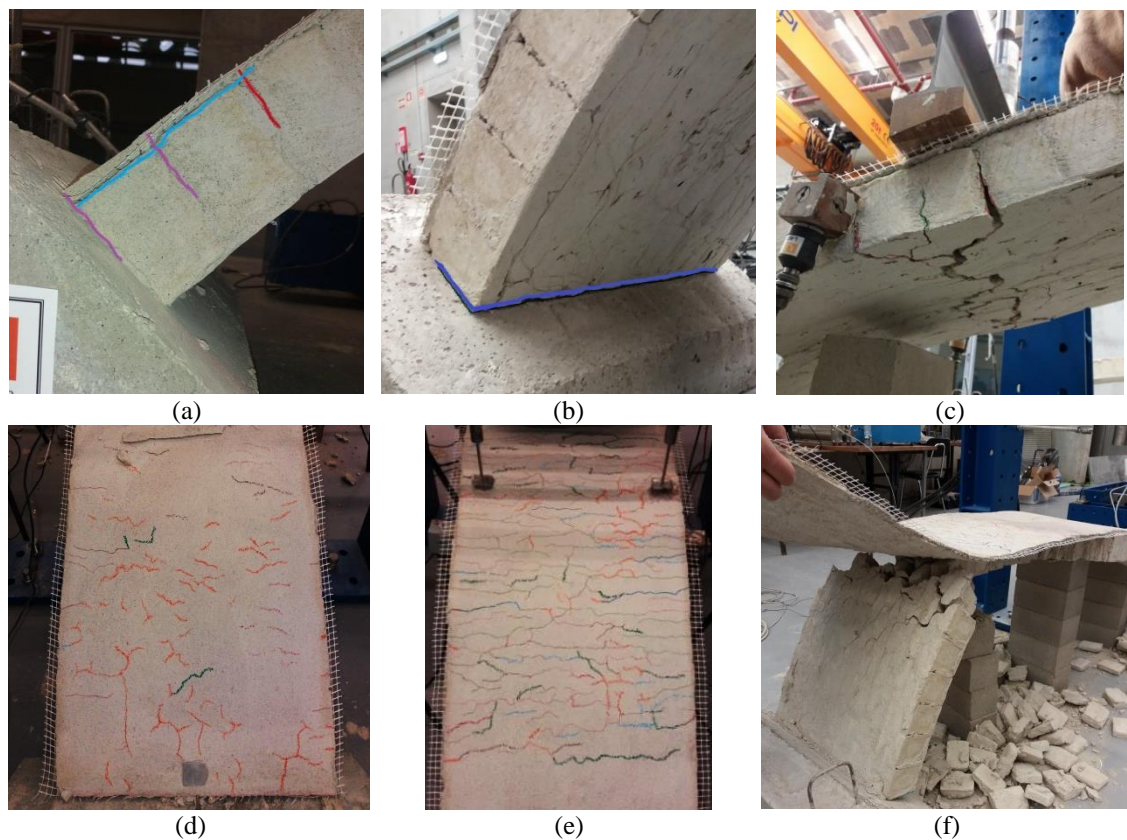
Damage development of the vault models strengthened at the extrados: (a) detachment of strengthening at section A (SE2); (b) cracks at section J (SE1); (c) cracks at section F (SE2); (d) cracks at section C (SE2); (e) cracks at section G (SE2); (f) detachment of strengthening layer at section G and I (SE1).
